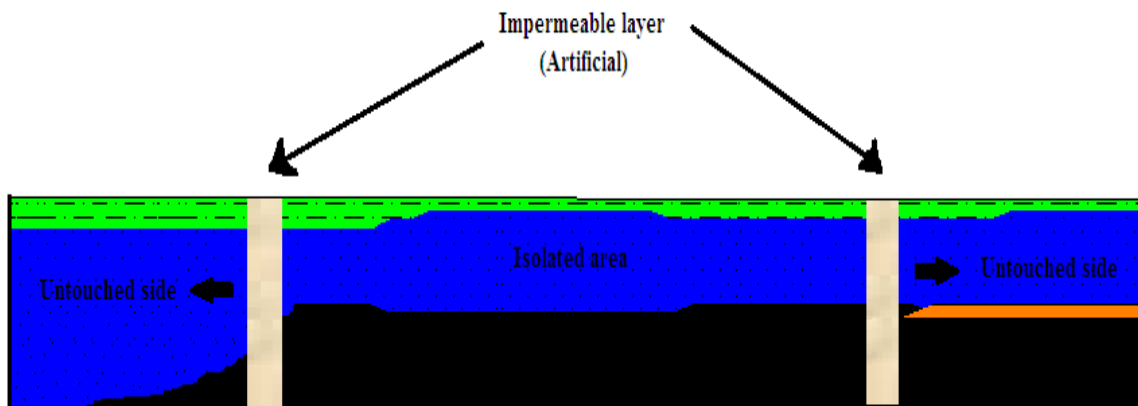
Schematic cross-section of the Northern part showing isolation grouting technique
